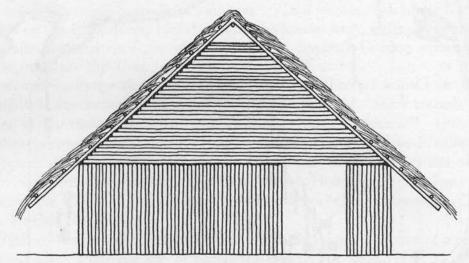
HOUSE WITH CANE WALL CONSTRUCTION, LAKE AMATITLAN, GUATEMALA
